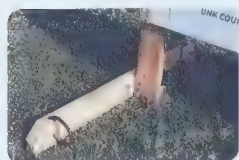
| Two-foot long rebar anchored each of the walls at all four corners
